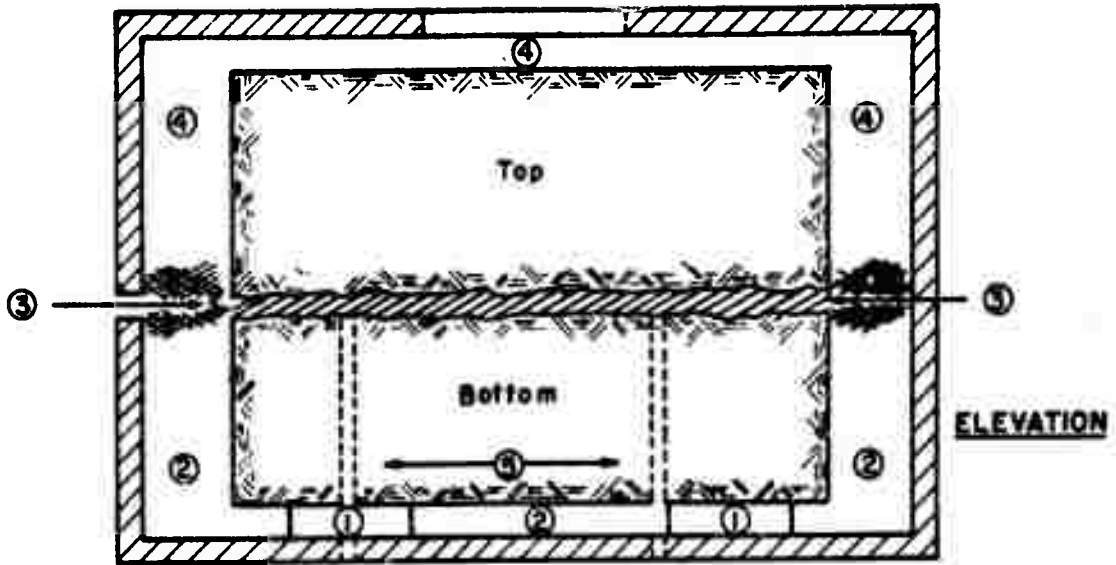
SHEAR SPECIMEN ASSEMBLED FOR TESTING (LEGEND IN TEXT)
